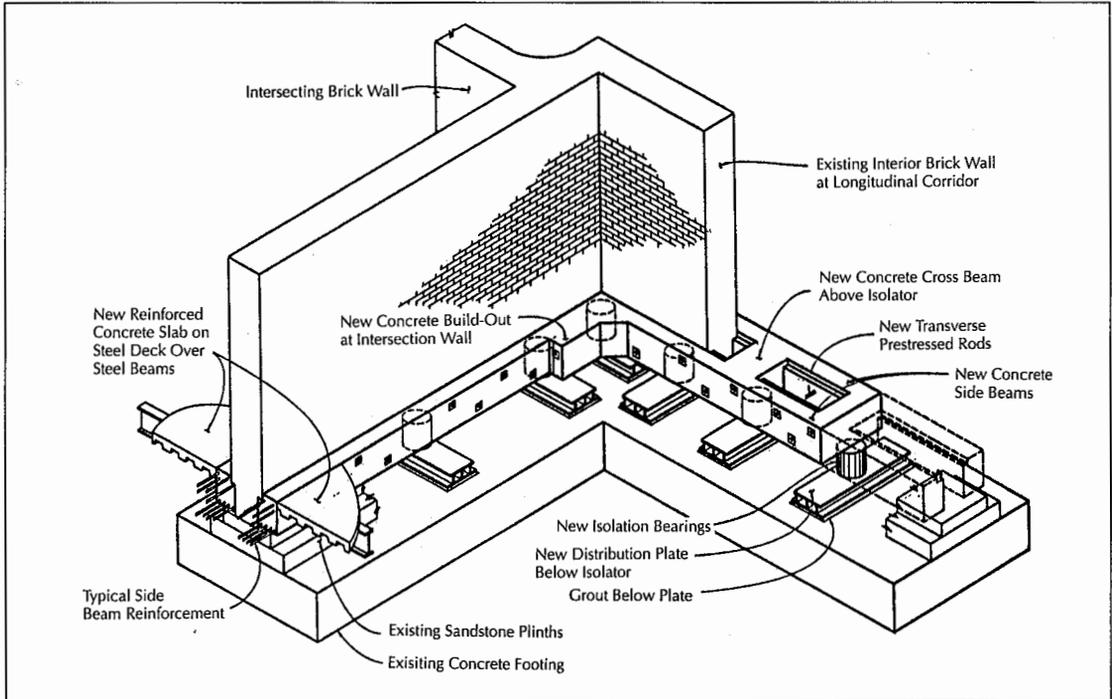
An isometric cutaway at an interior wall intersection (Salt Lake City).
